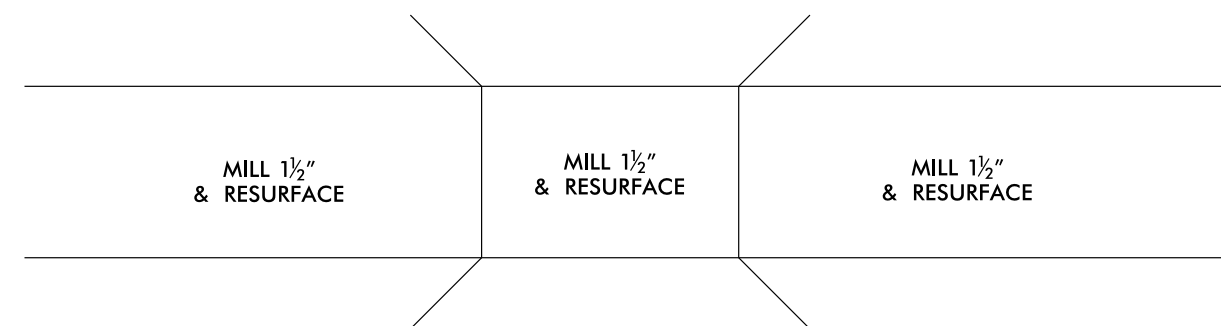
DETAILS OF PATCHING EXISTING PAVEMENT PRIOR TO RESURFACING
